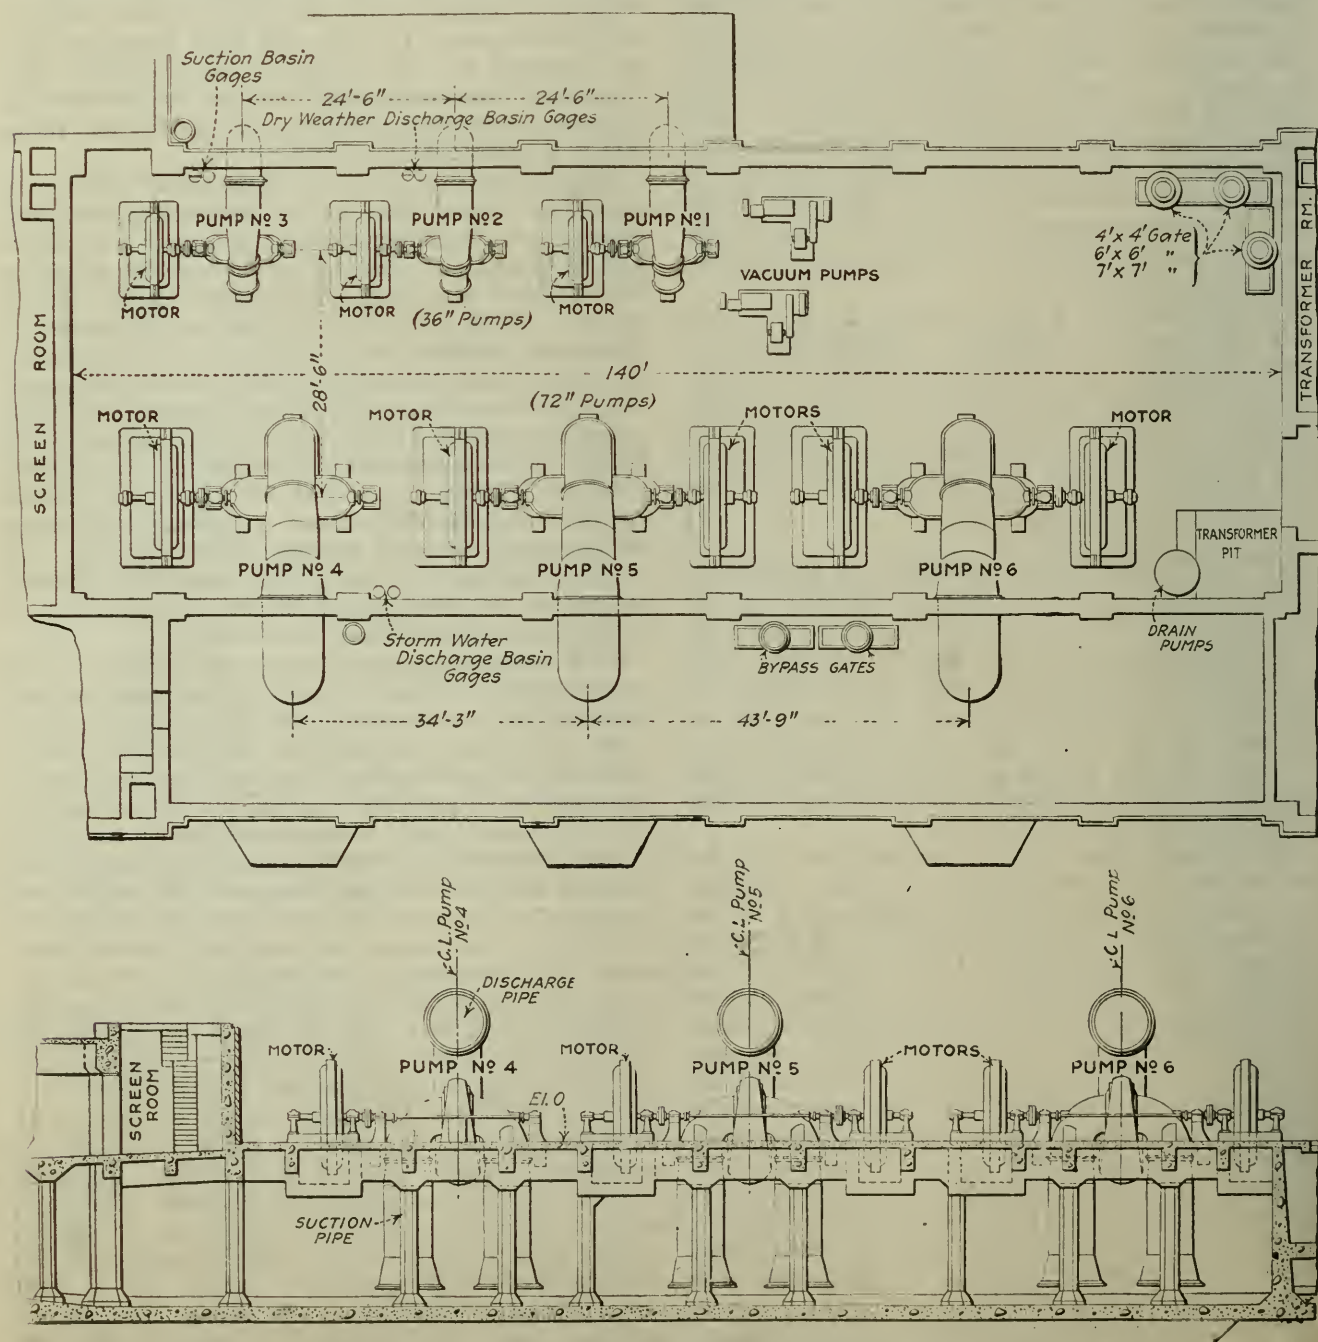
PLAN AND SECTION OF CALUMET SEWAGE PUMPING STATION
